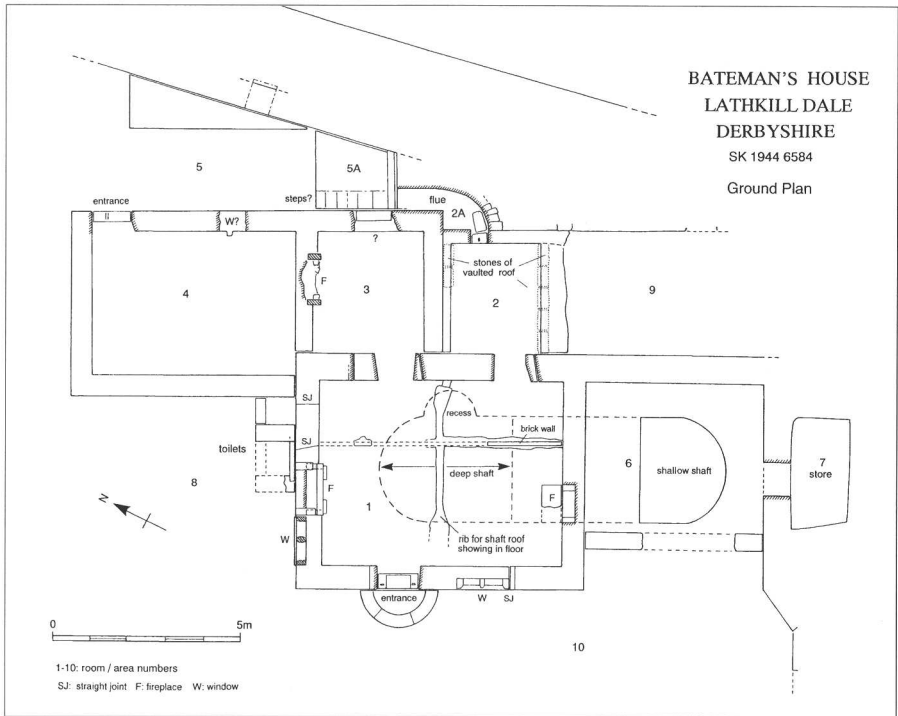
Bateman's House, Lathkill Dale: plan of building and shafts; scale 1:200.
